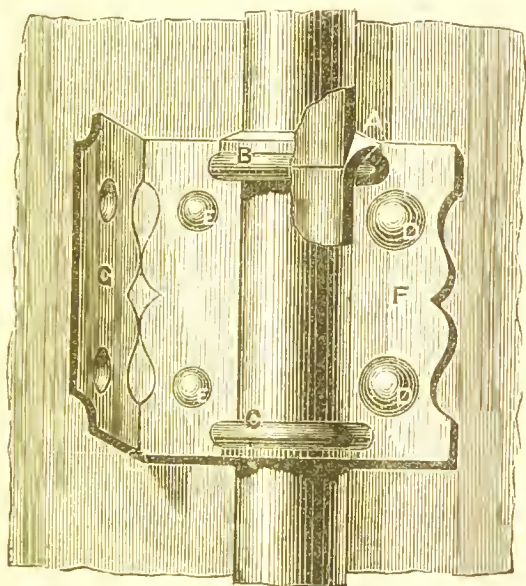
View of a Soldered joint with Astragals and Tacks,
